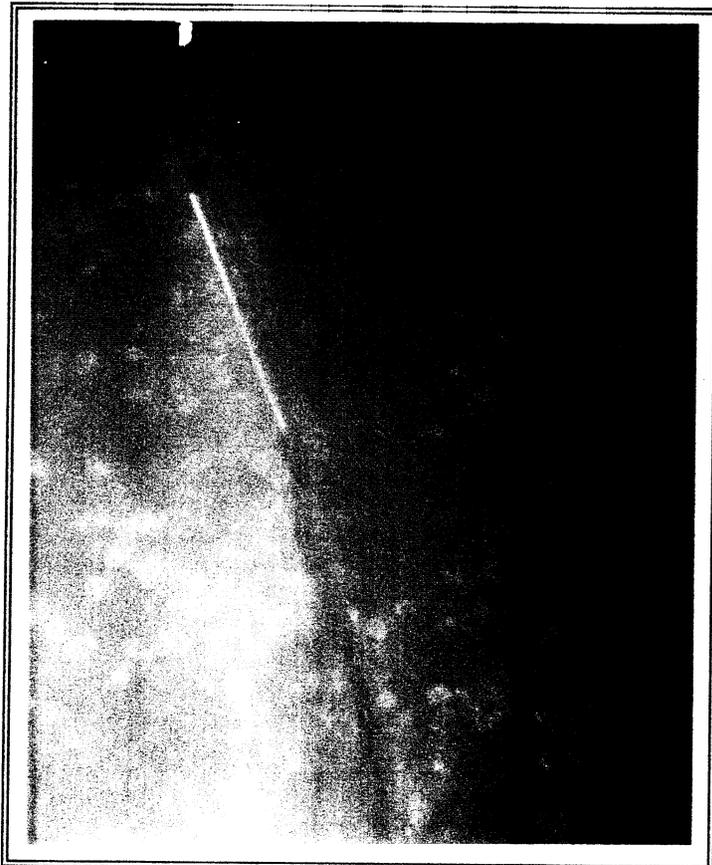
South Bascule, East Face - Severe crack along the diagonal face at STA 0+20, elevation -14 to -20, (MDL). This crack ranges from 1/2" to 3/4" in width and greater than 6" in depth.
